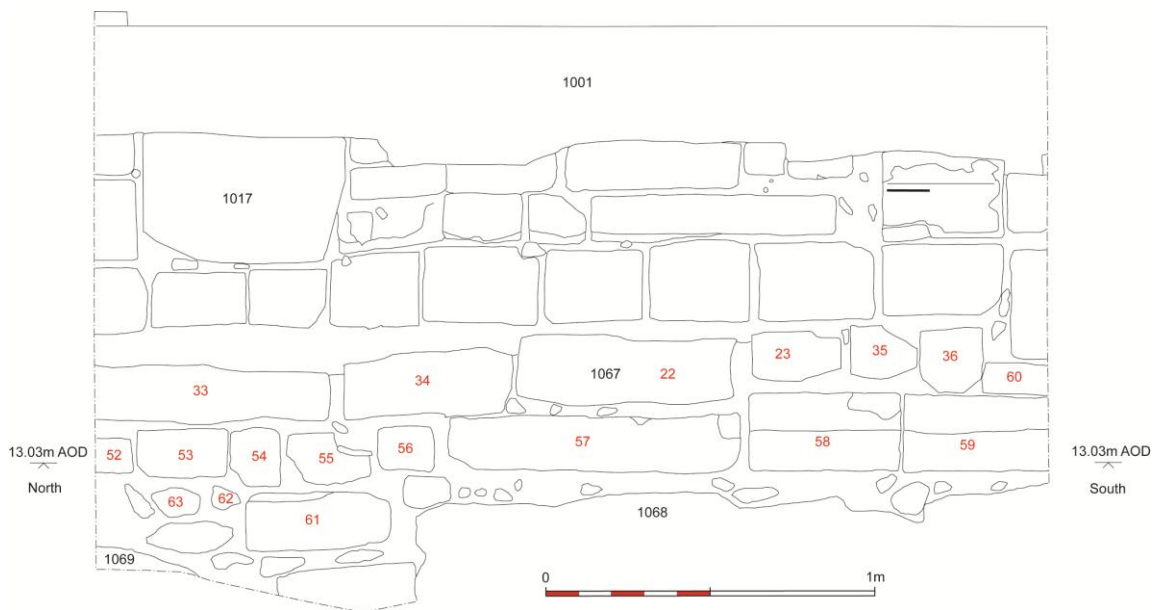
West facing elevation of arcade foundation, with removed stones numbered in red
